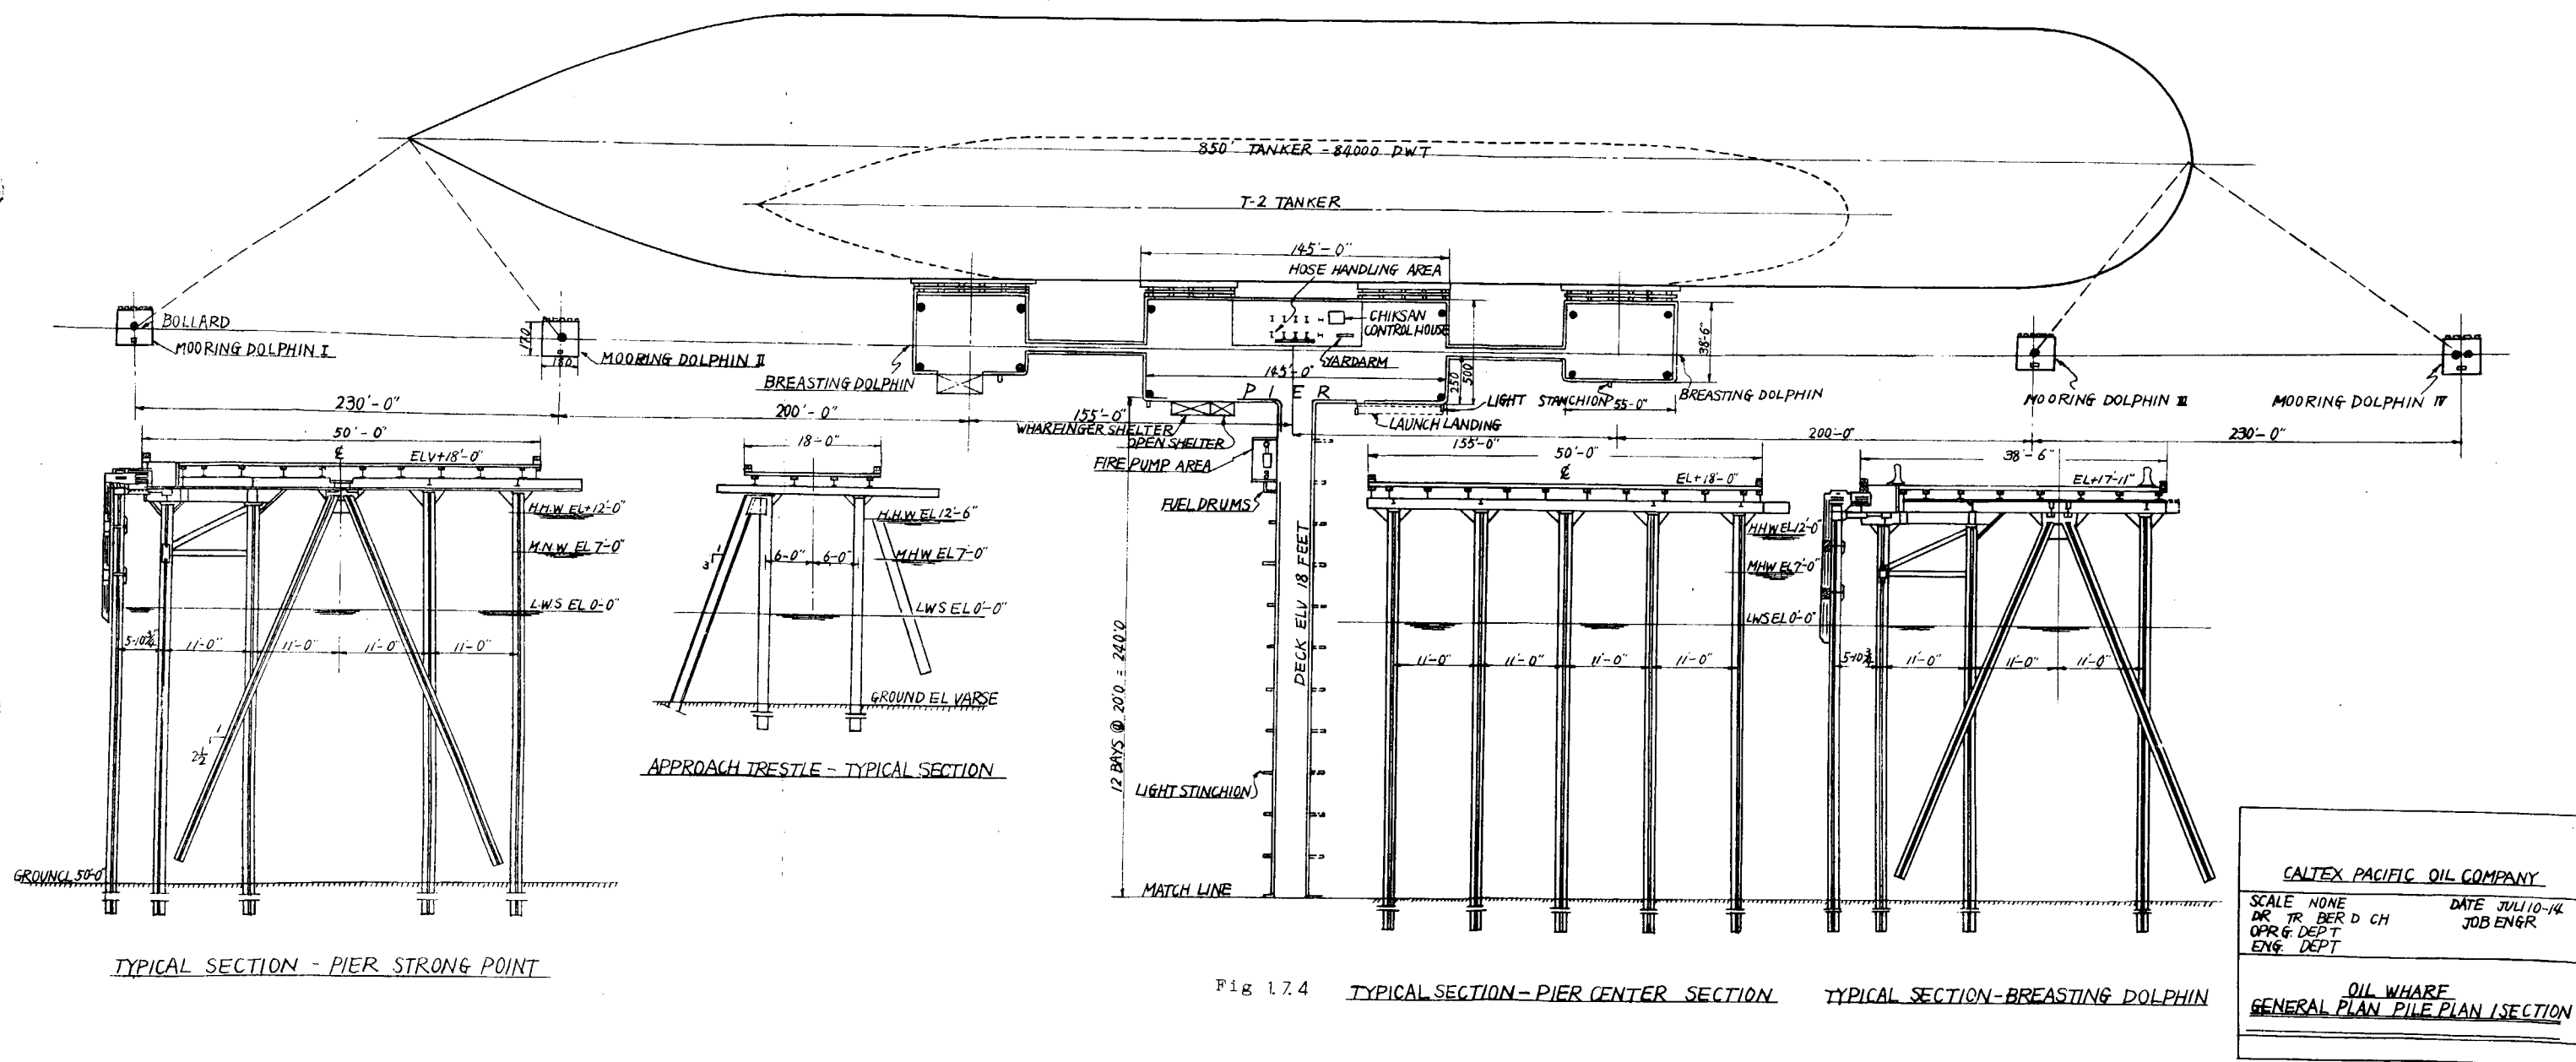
TYPICAL SECTION - PIER CENTER SECTION TYPICAL SECTION - BREASTING DOLPHIN
